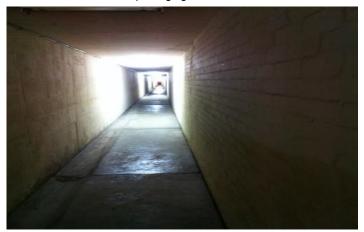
View of the underground north-south tunnel (looking north)
